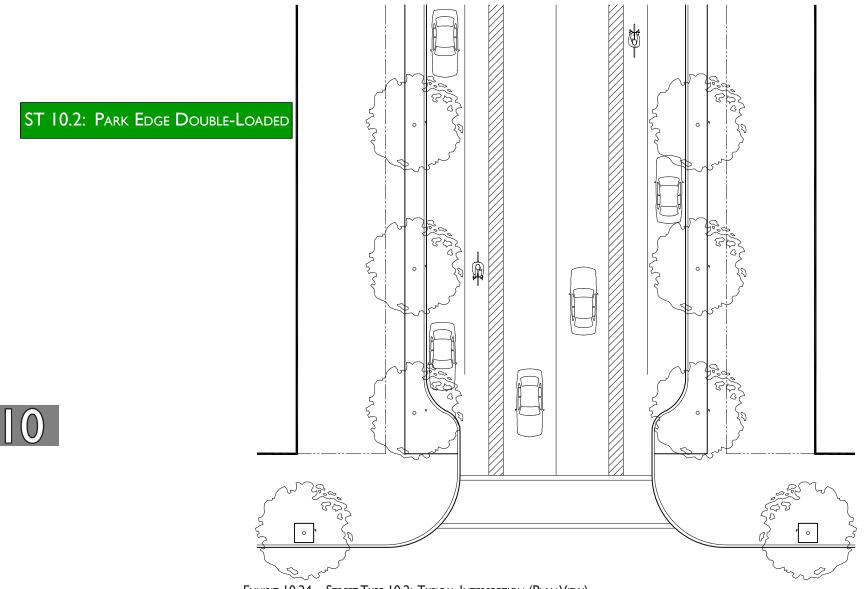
STREET TYPE 10.2: TYPICAL INTERSECTION (PLAN VIEW)
